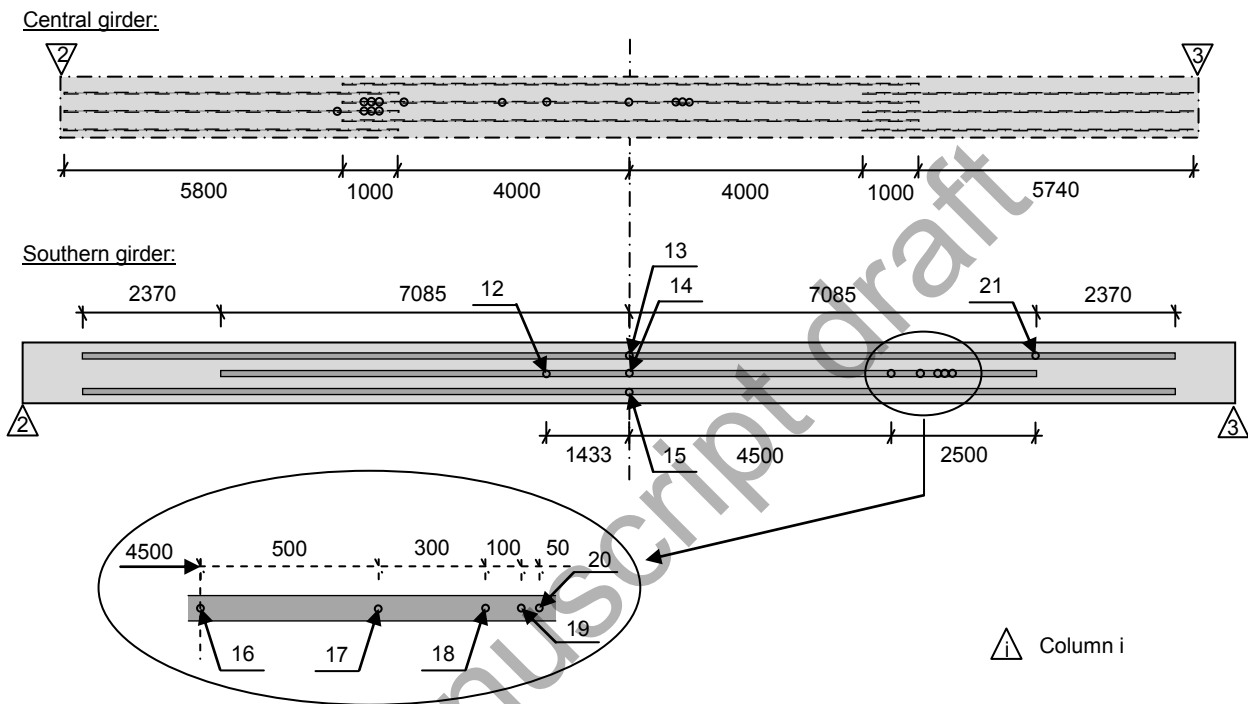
Strengthening of the Kiruna Bridge; three overlapping NSM bars were installed on the central girder and three prestressed laminates on the southern girder. Strain gauges on the laminates are numbered 12 – 21.
